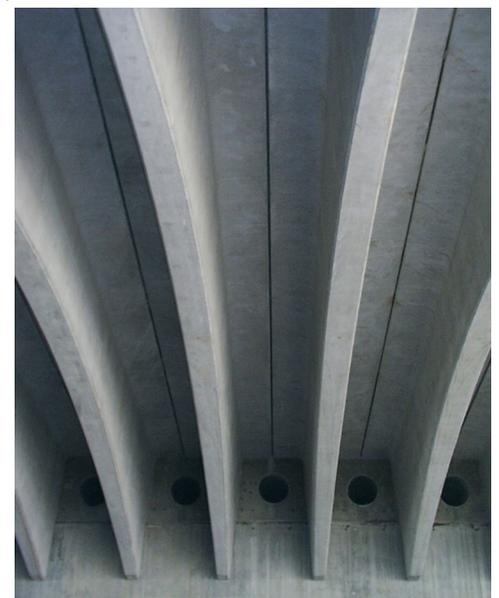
Detail of floorbeams at connection to longitudinal girder. Note holes in diaphragm for ventilation system.
